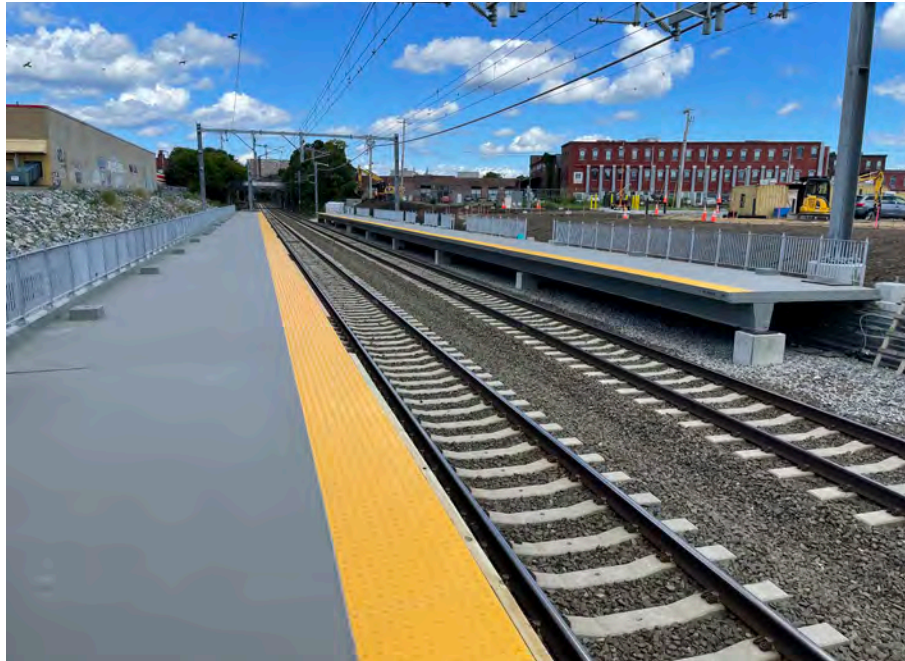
VIP-Molded FRP Deck Panels Used on Rail Crossing Pedestrian Bridge (Boston, MA) (Source: Creative Composites Group)
